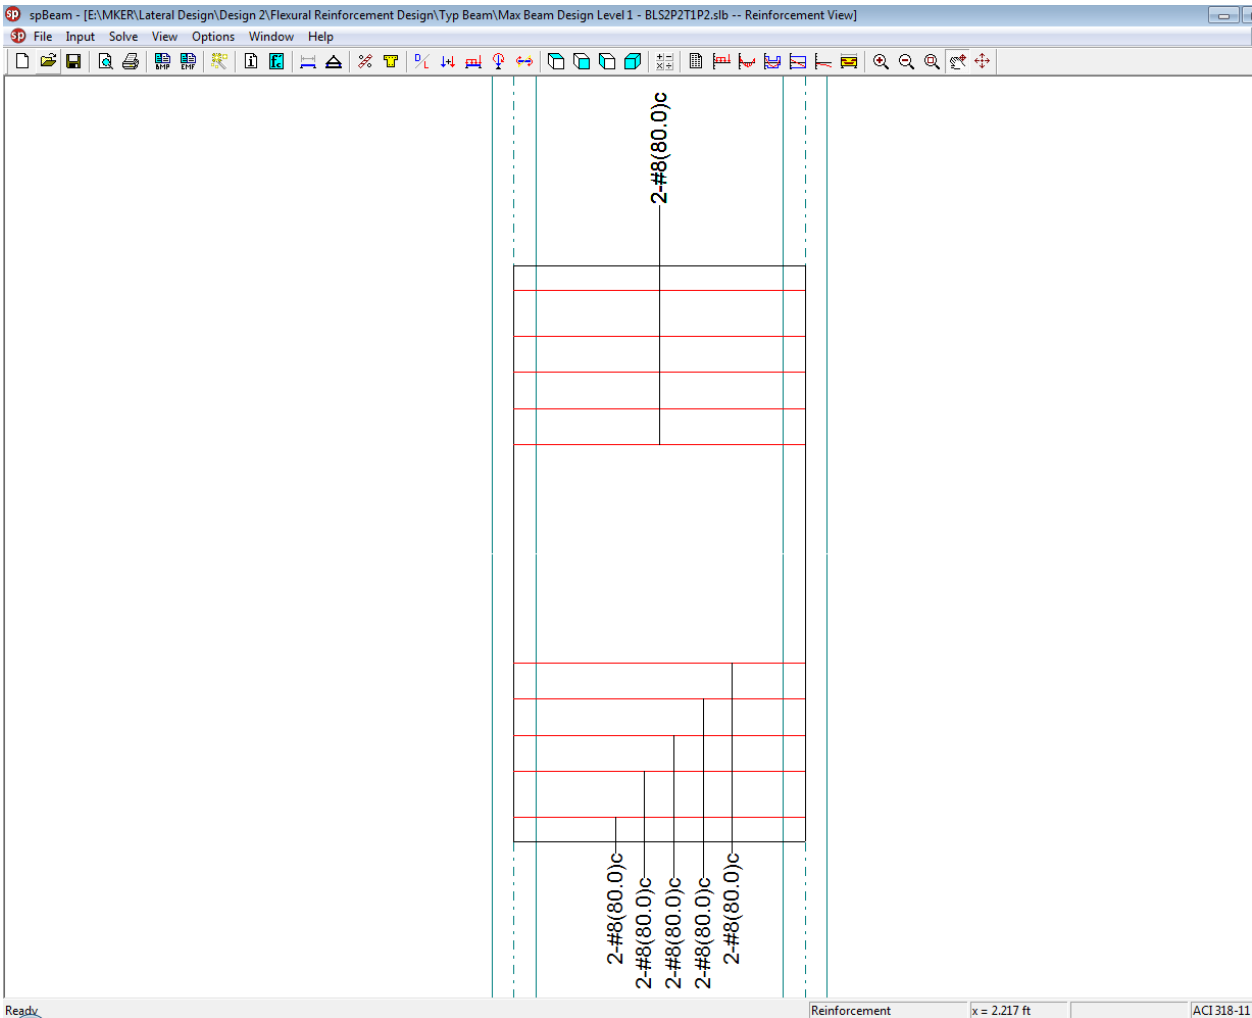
, spBeam Flexural Reinforcement Design of BLS2P2T1P2 Lvl. 1
